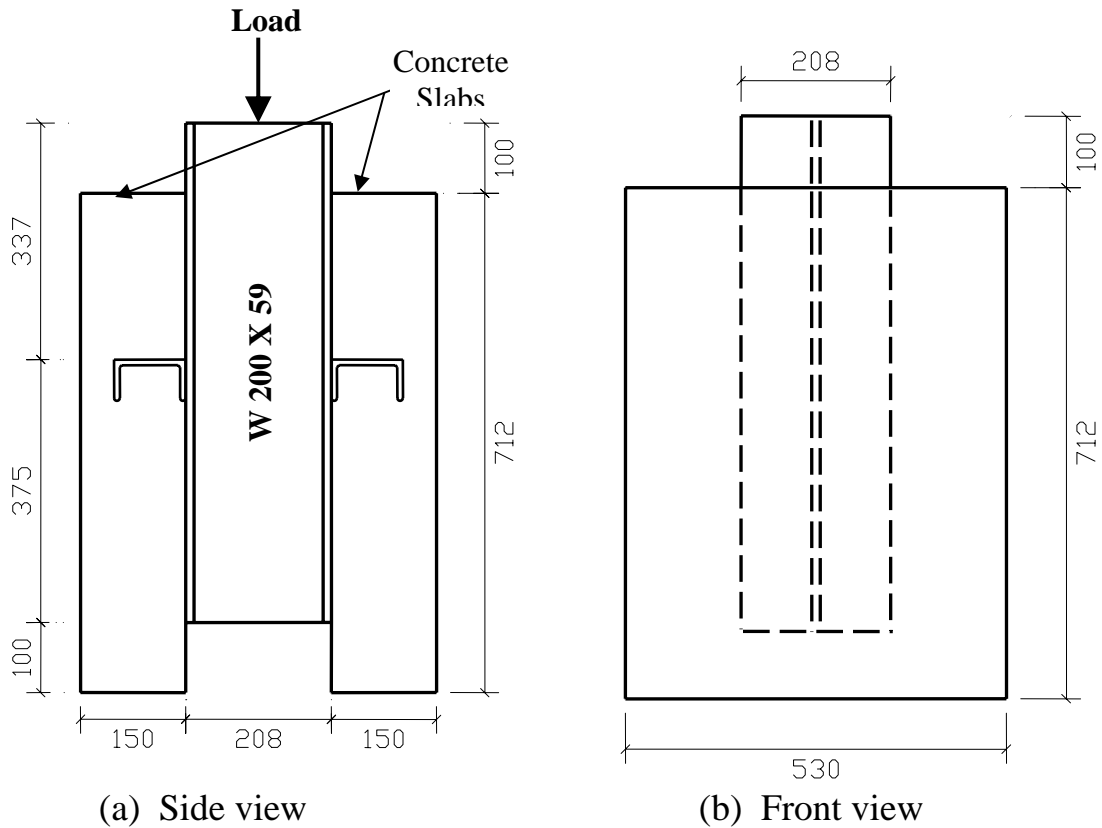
Push-out specimen with solid concrete slab (dimensions in mm).
